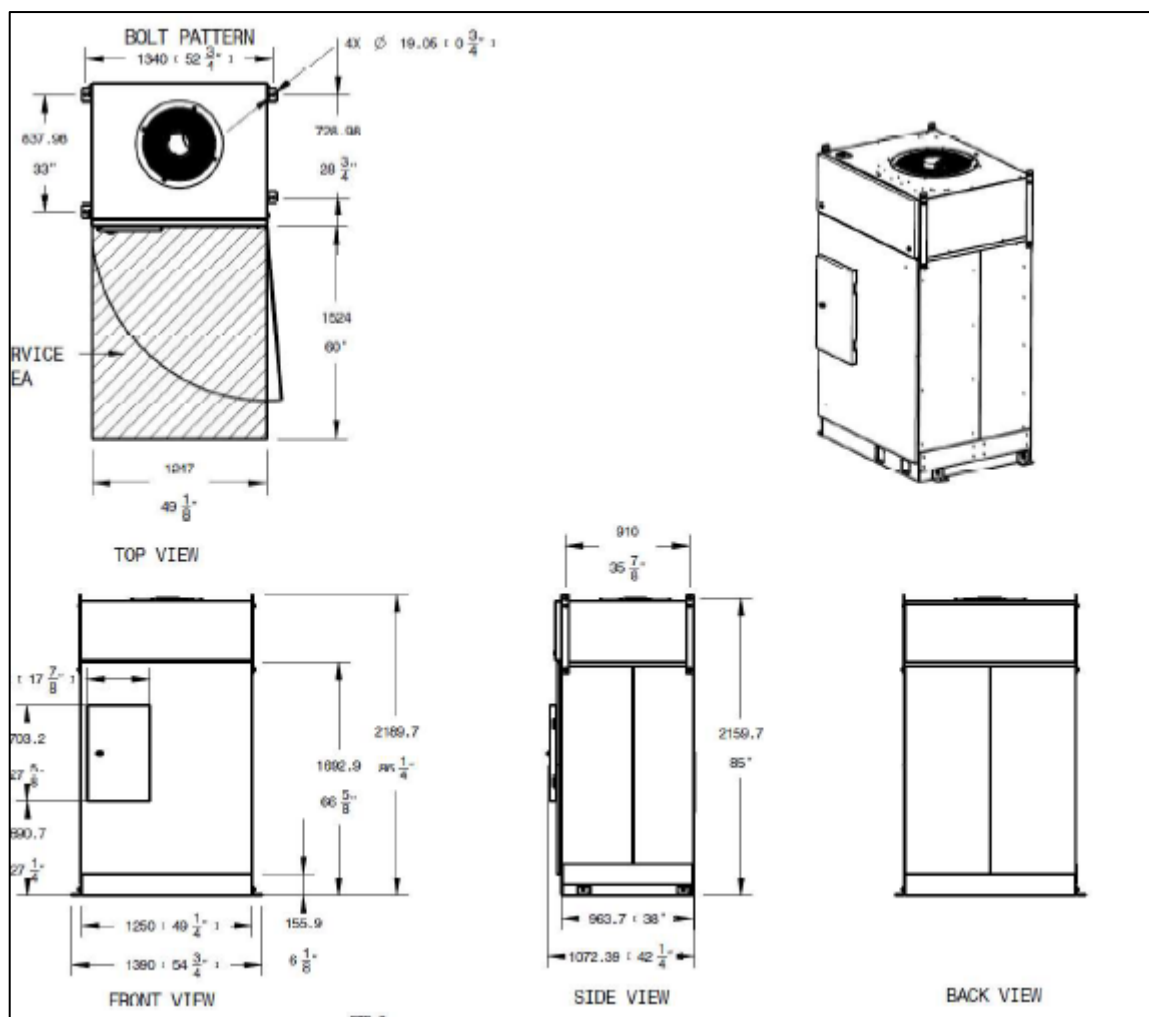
Elevational Drawings of Proposed Tesla Equipment Cabinets
